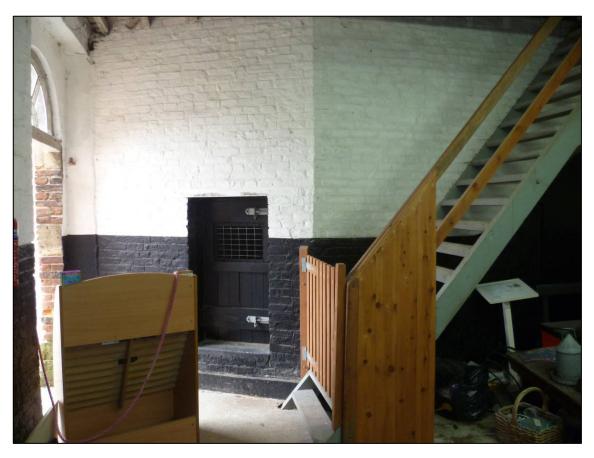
North range, east end, ground floor room (GF1), door in angled west wall, looking W (photo 5/903).
